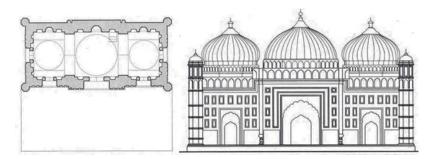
Shows, Rectangular Plan and Elevation of Lalbagh Fort Mosque at Lalbagh, Old Dhaka that shows 03 Dome.
